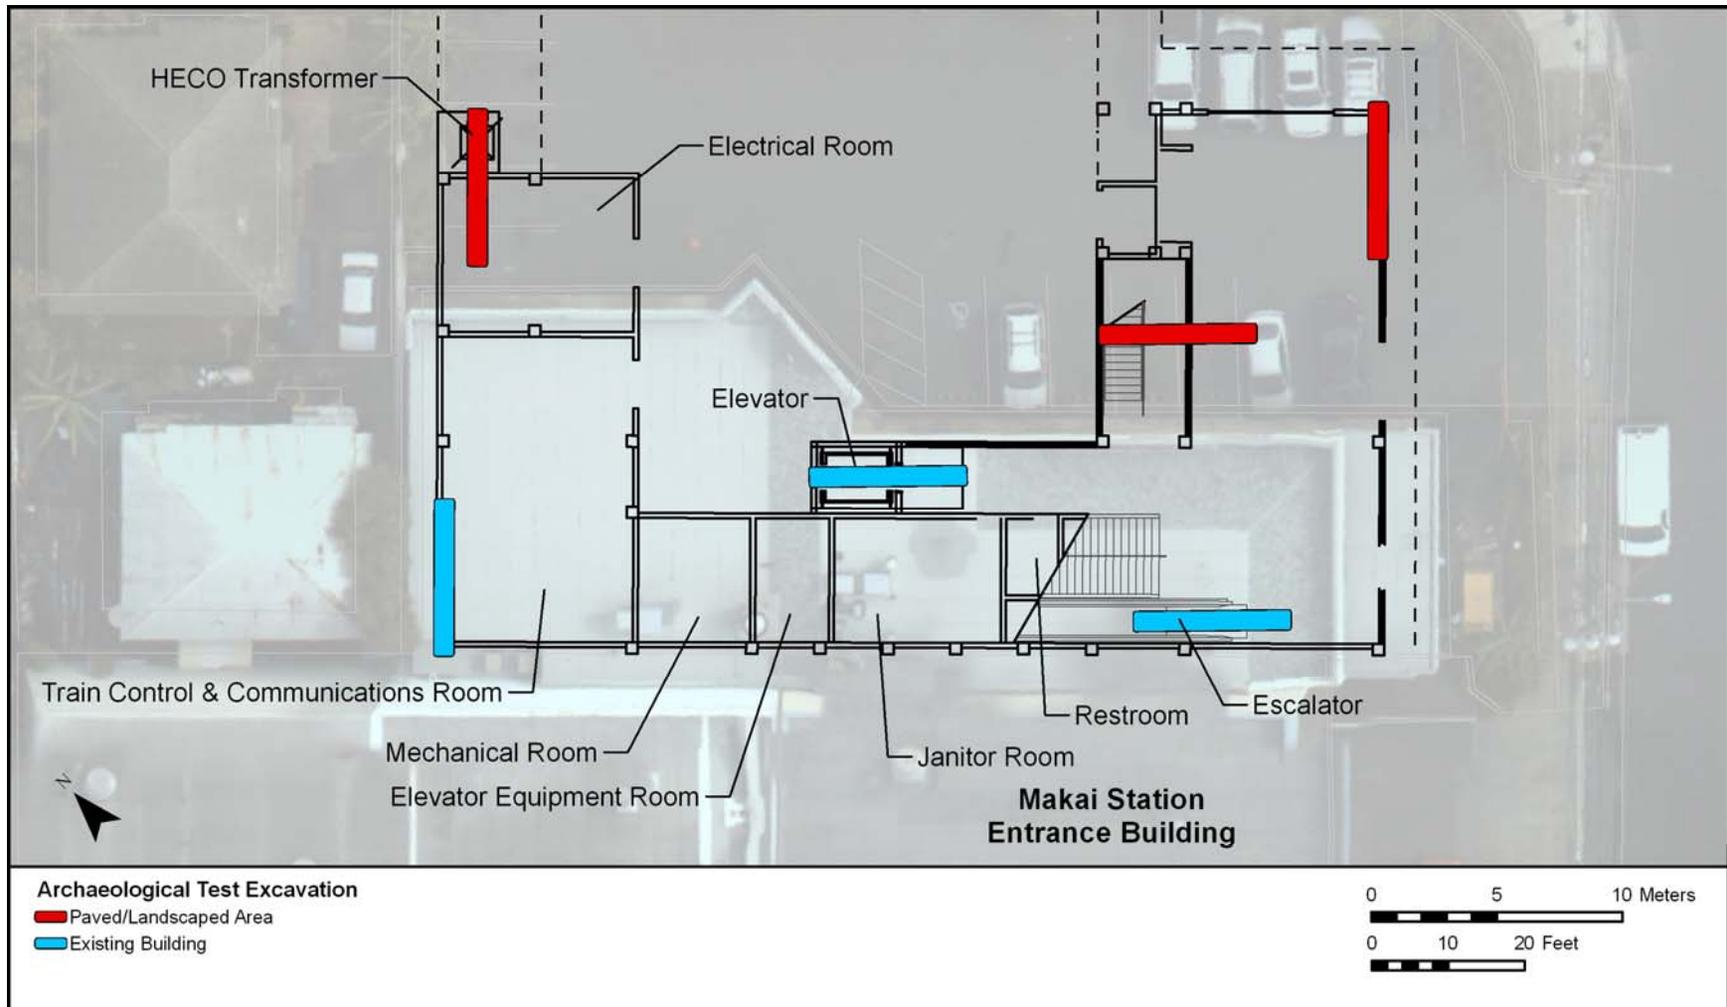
Kalihi Station, detail of (*makai*) Station Entrance Building showing proposed locations for archaeological inventory survey testing (six 2' by 20' test trenches)
